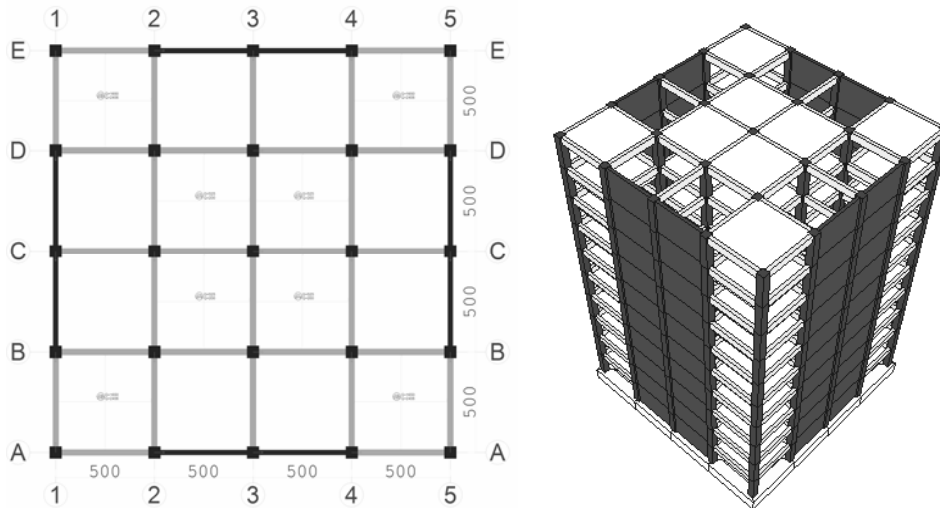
Structural plan and 3D view of parametric model IIIe
